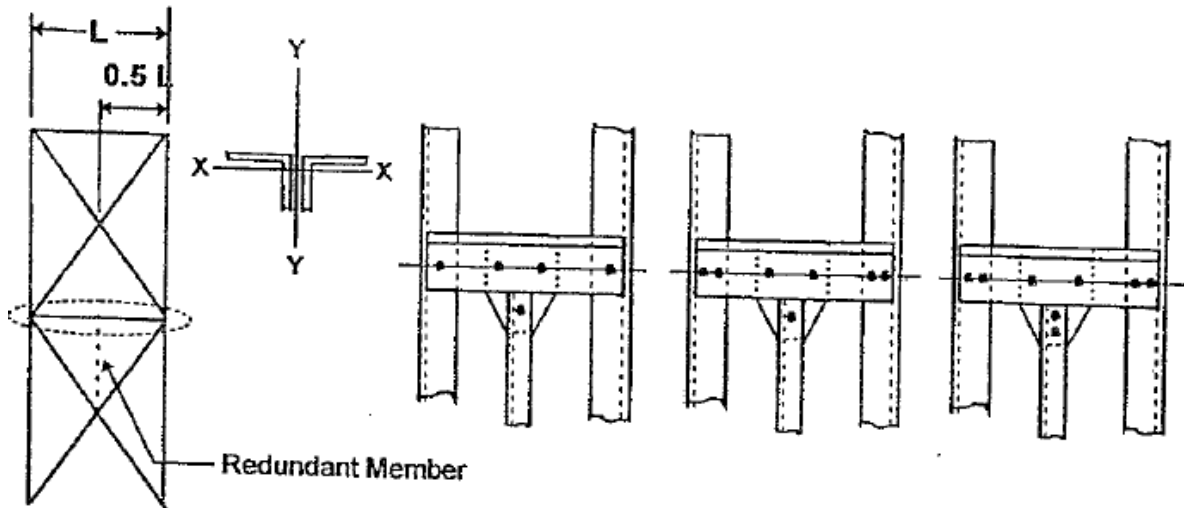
Concentric Loading, Two Angle Member, Subdivided Panels
